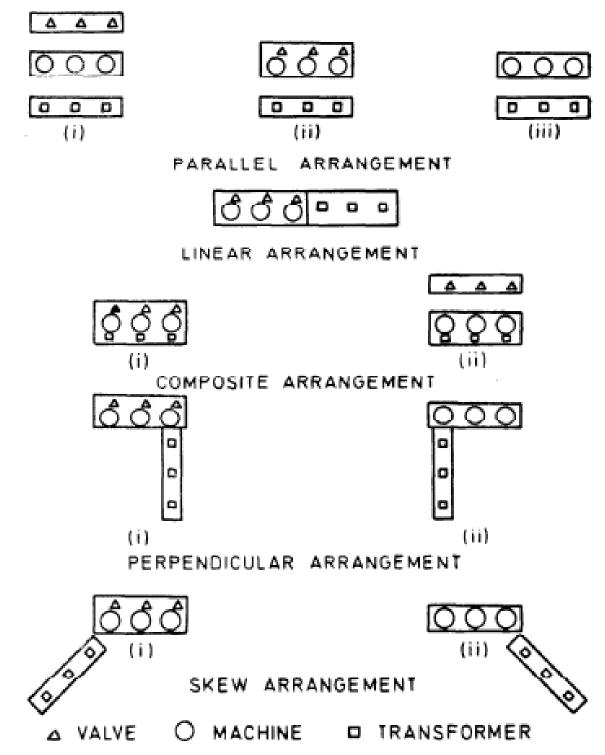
TYPES OF LAYOUT FOR UNDERGROUND POWER STATIONS (BUS DUCT GALLERIES CONNECTING POWER HOUSE CAVITY & TRANSFORMER HALL CAVITY NEED TO BE PROVIDED AS PER THE SUITABLE ARRANGEMENT CHOSEN FOR LAYOUT OF UNDERGROUND POWER STATIONS)
